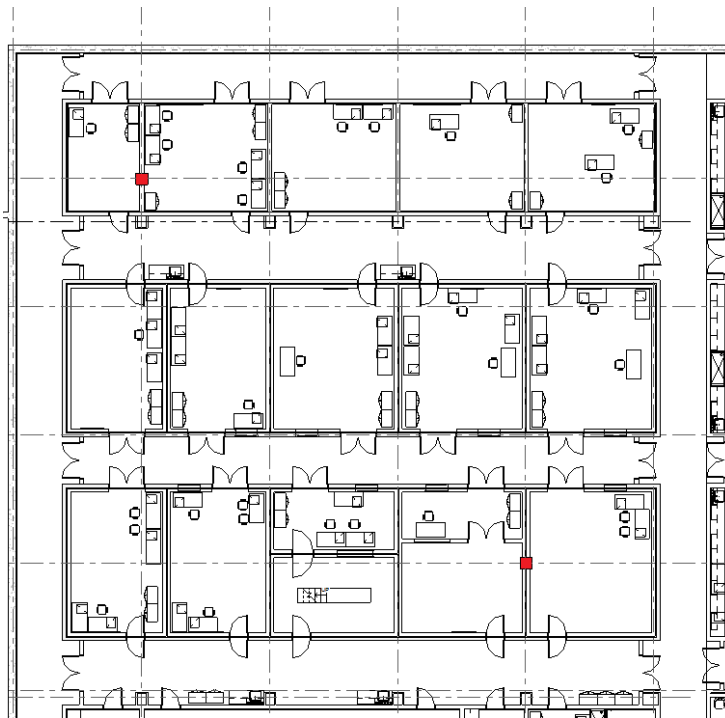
Basement Floor Plan with Cantilever Support Columns
